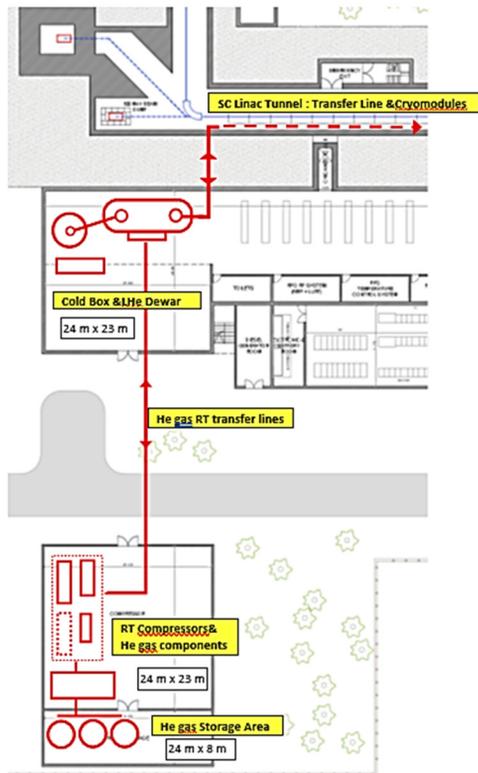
Schema for MINERVA Linac and cryogenic plant buildings.
